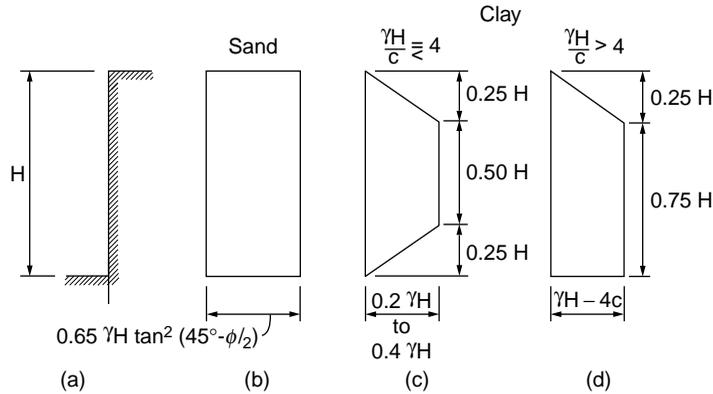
Lateral pressure distribution for computation of strut loads in braced excavation systems. (After Terzaghi, K., and Peck, R. 1967. *Soil Mechanics in Engineering Practice*. John Wiley & Sons, New York. Copyright © 1967 John Wiley & Sons, Inc. Reprinted by permission of John Wiley & Sons, Inc.)
